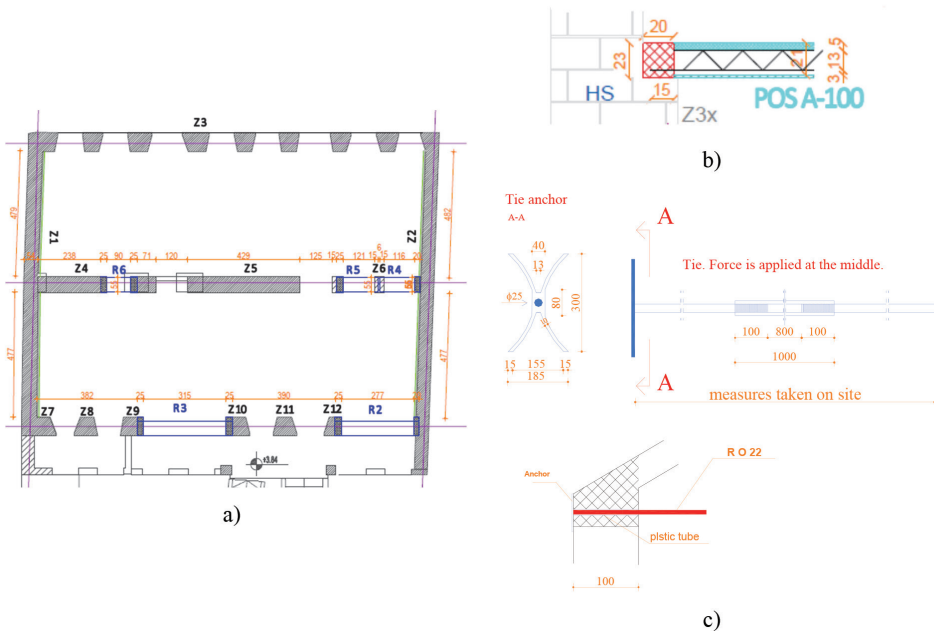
a) Floor plan of a masonry structure with interventions (measures in cm) [8] b) detail of new RC floor slab and confiment belt (measures in cm) [9] c) Steel ties at the top of the church wall (measures in mm)[10]
